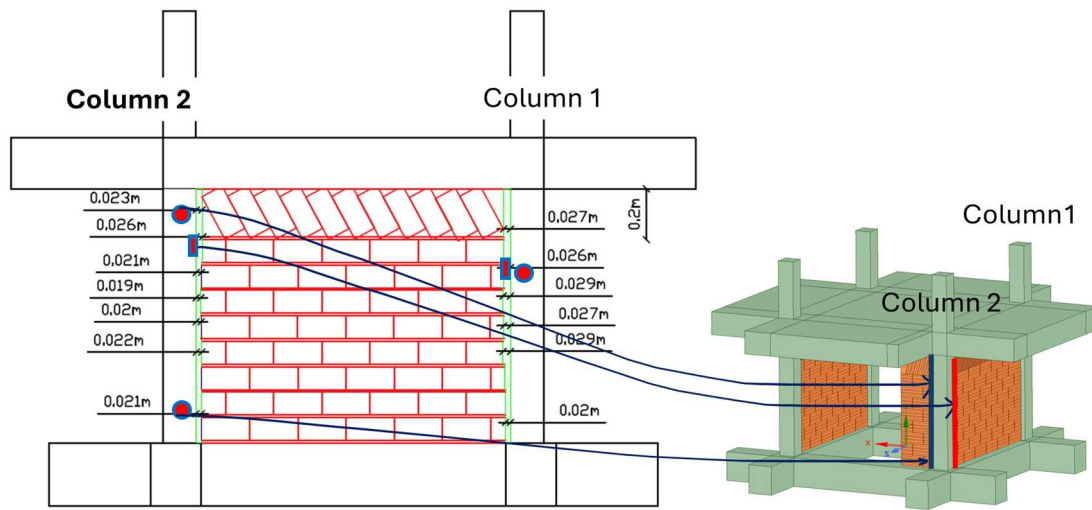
Location of the PZT patches installed at the surface of column 2
